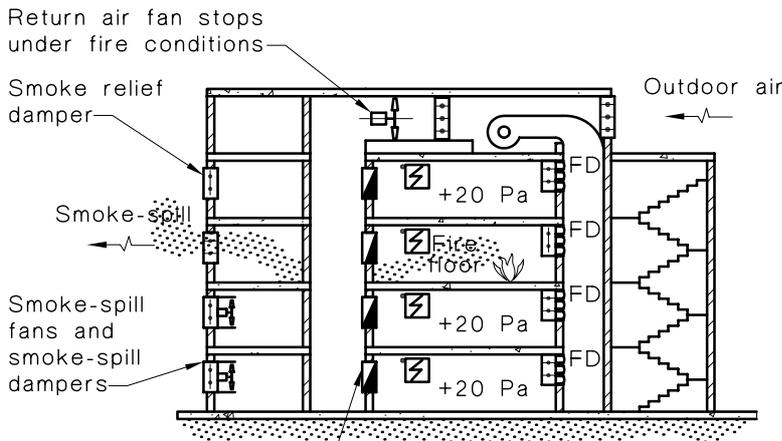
ZONE PRESSURIZATION SYSTEM—TYPICAL INSTALLATION WITH INTERMEDIATE PLANT ROOMS ABOVE COMPARTMENTS
